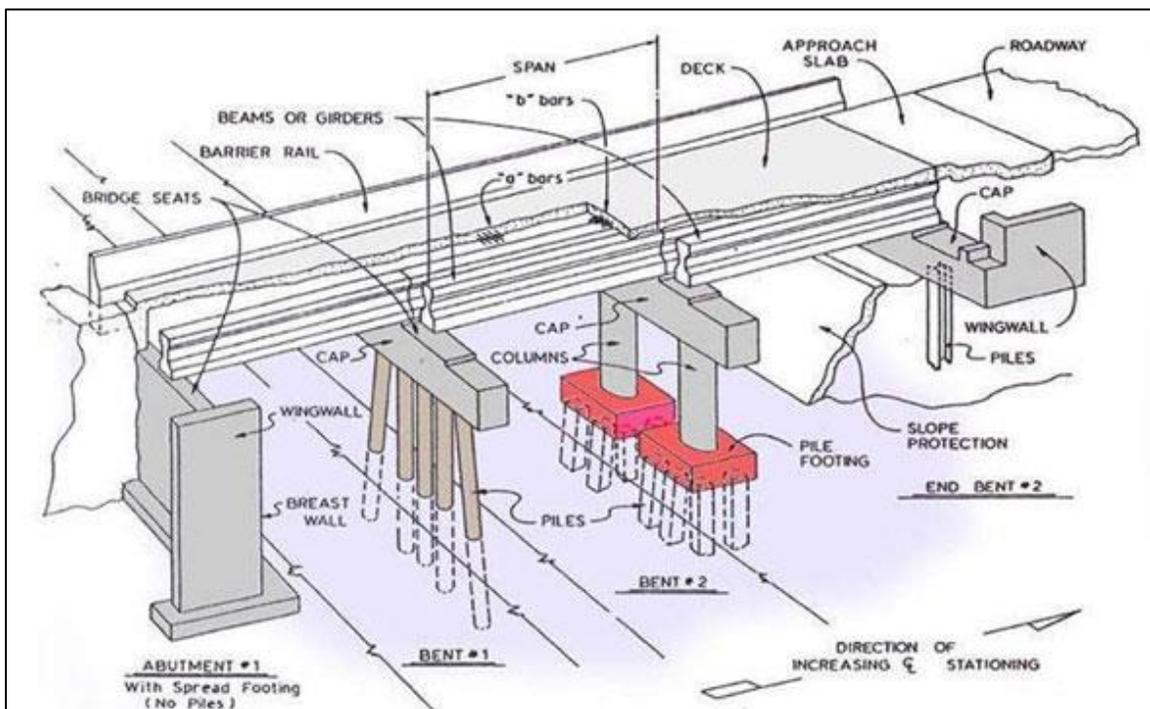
Typical Bridge Components. Image courtesy of www.sketchup3dconstruction.com.
